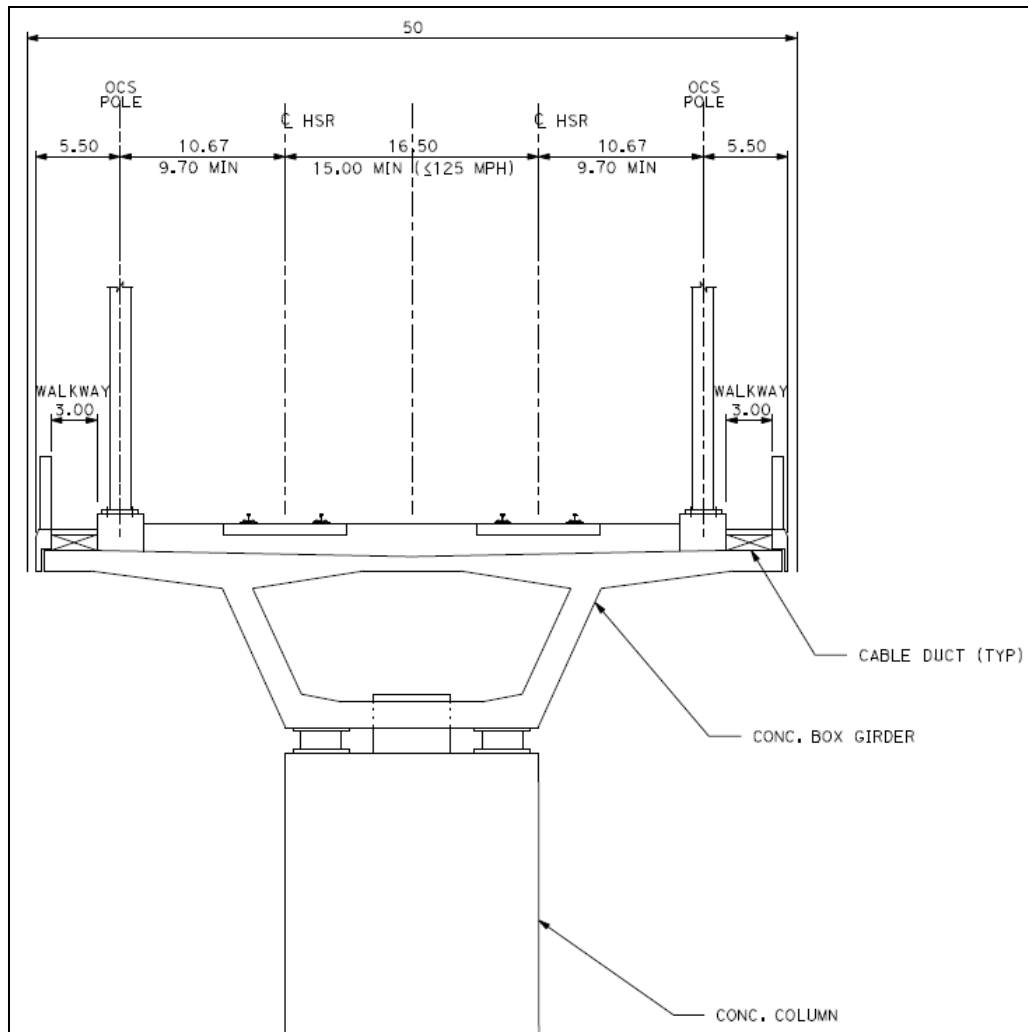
Aerial structure cross-section for California HSR project (Parsons Brinckerhoff, 2009)
